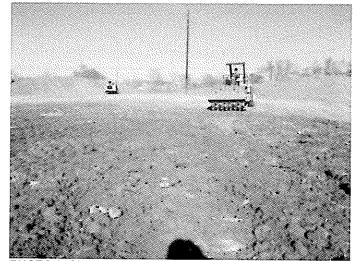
SHEEPSFOOT PULVERIZES ROCK PARTICLES
